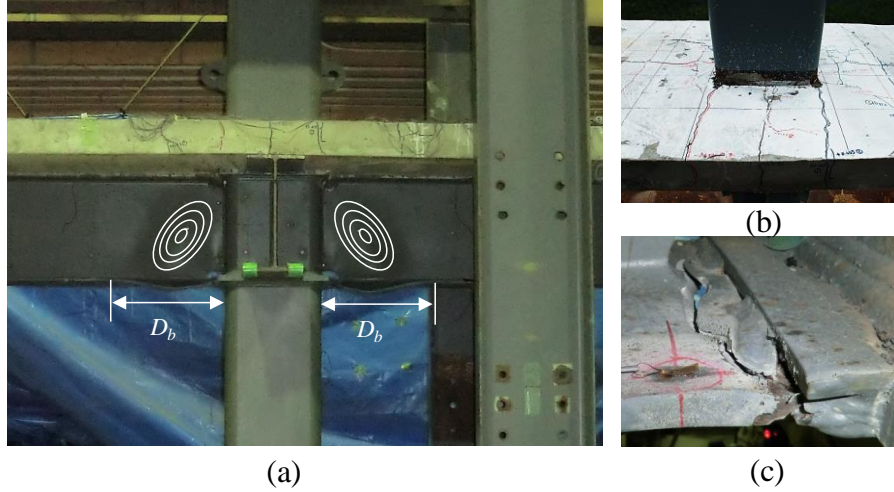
Damage pattern of composite connection: (a) Bottom flange buckling and web buckling; (b) RC slab crack and crush; (c) Bottom flange fracture
